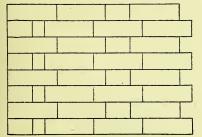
Flemish Garden Bond or Sussex Bond.
